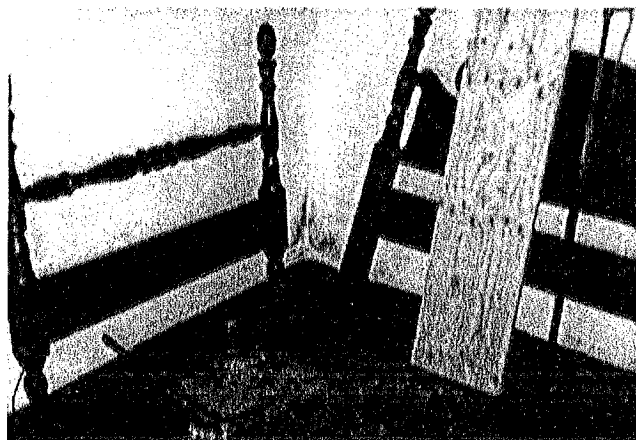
Bedroom 2 - Water damage and microbial growth in northwest corner
